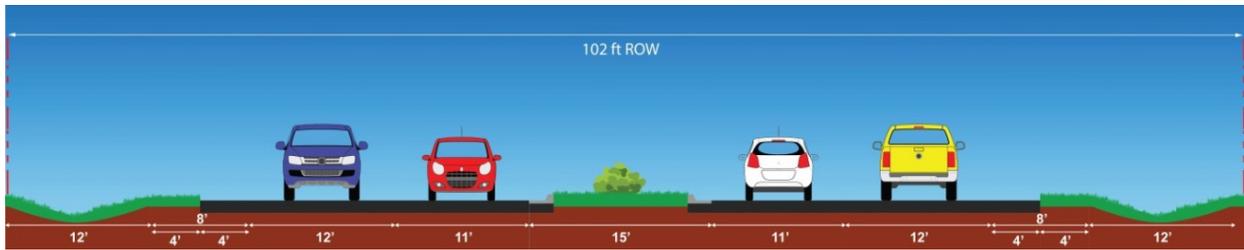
Recommended Rural Neighborhood Typical Section (Northern Segment)
